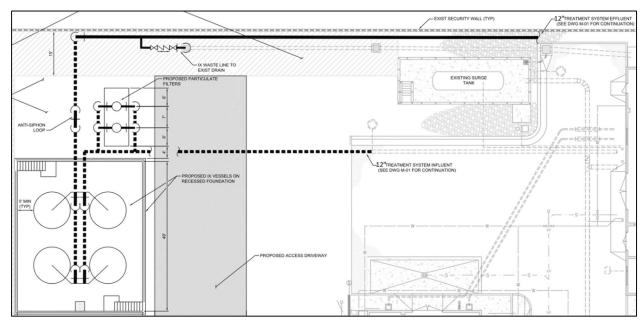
Pipelines Routes for Site Master Plan Alternative 2
